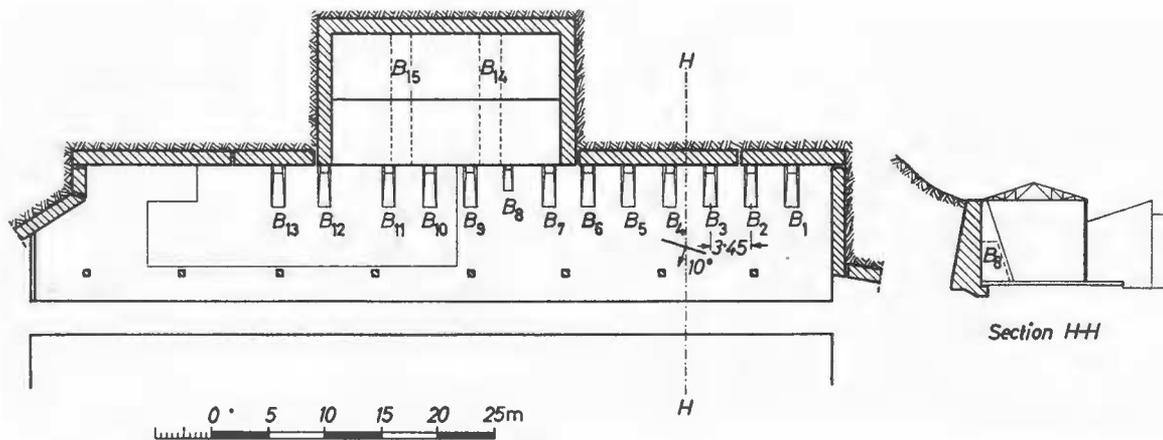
Plan of the buttresses to strengthen the retaining walls
